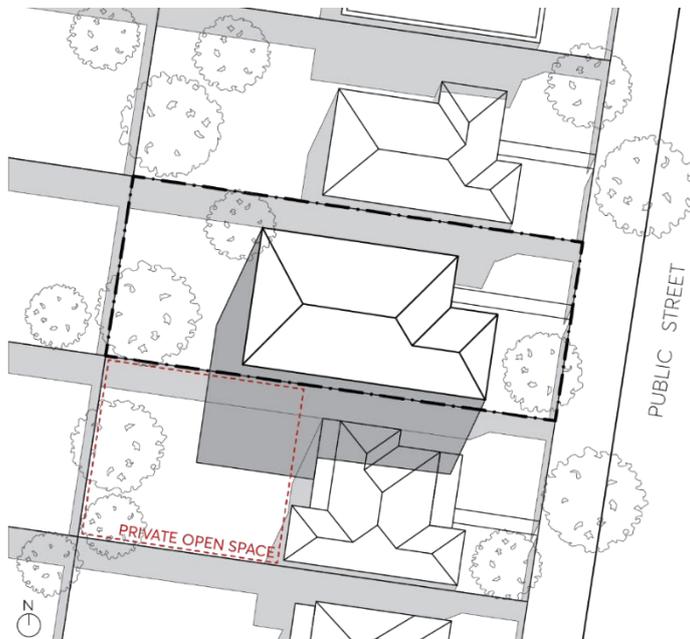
Solar access to adjoining properties and private open space
